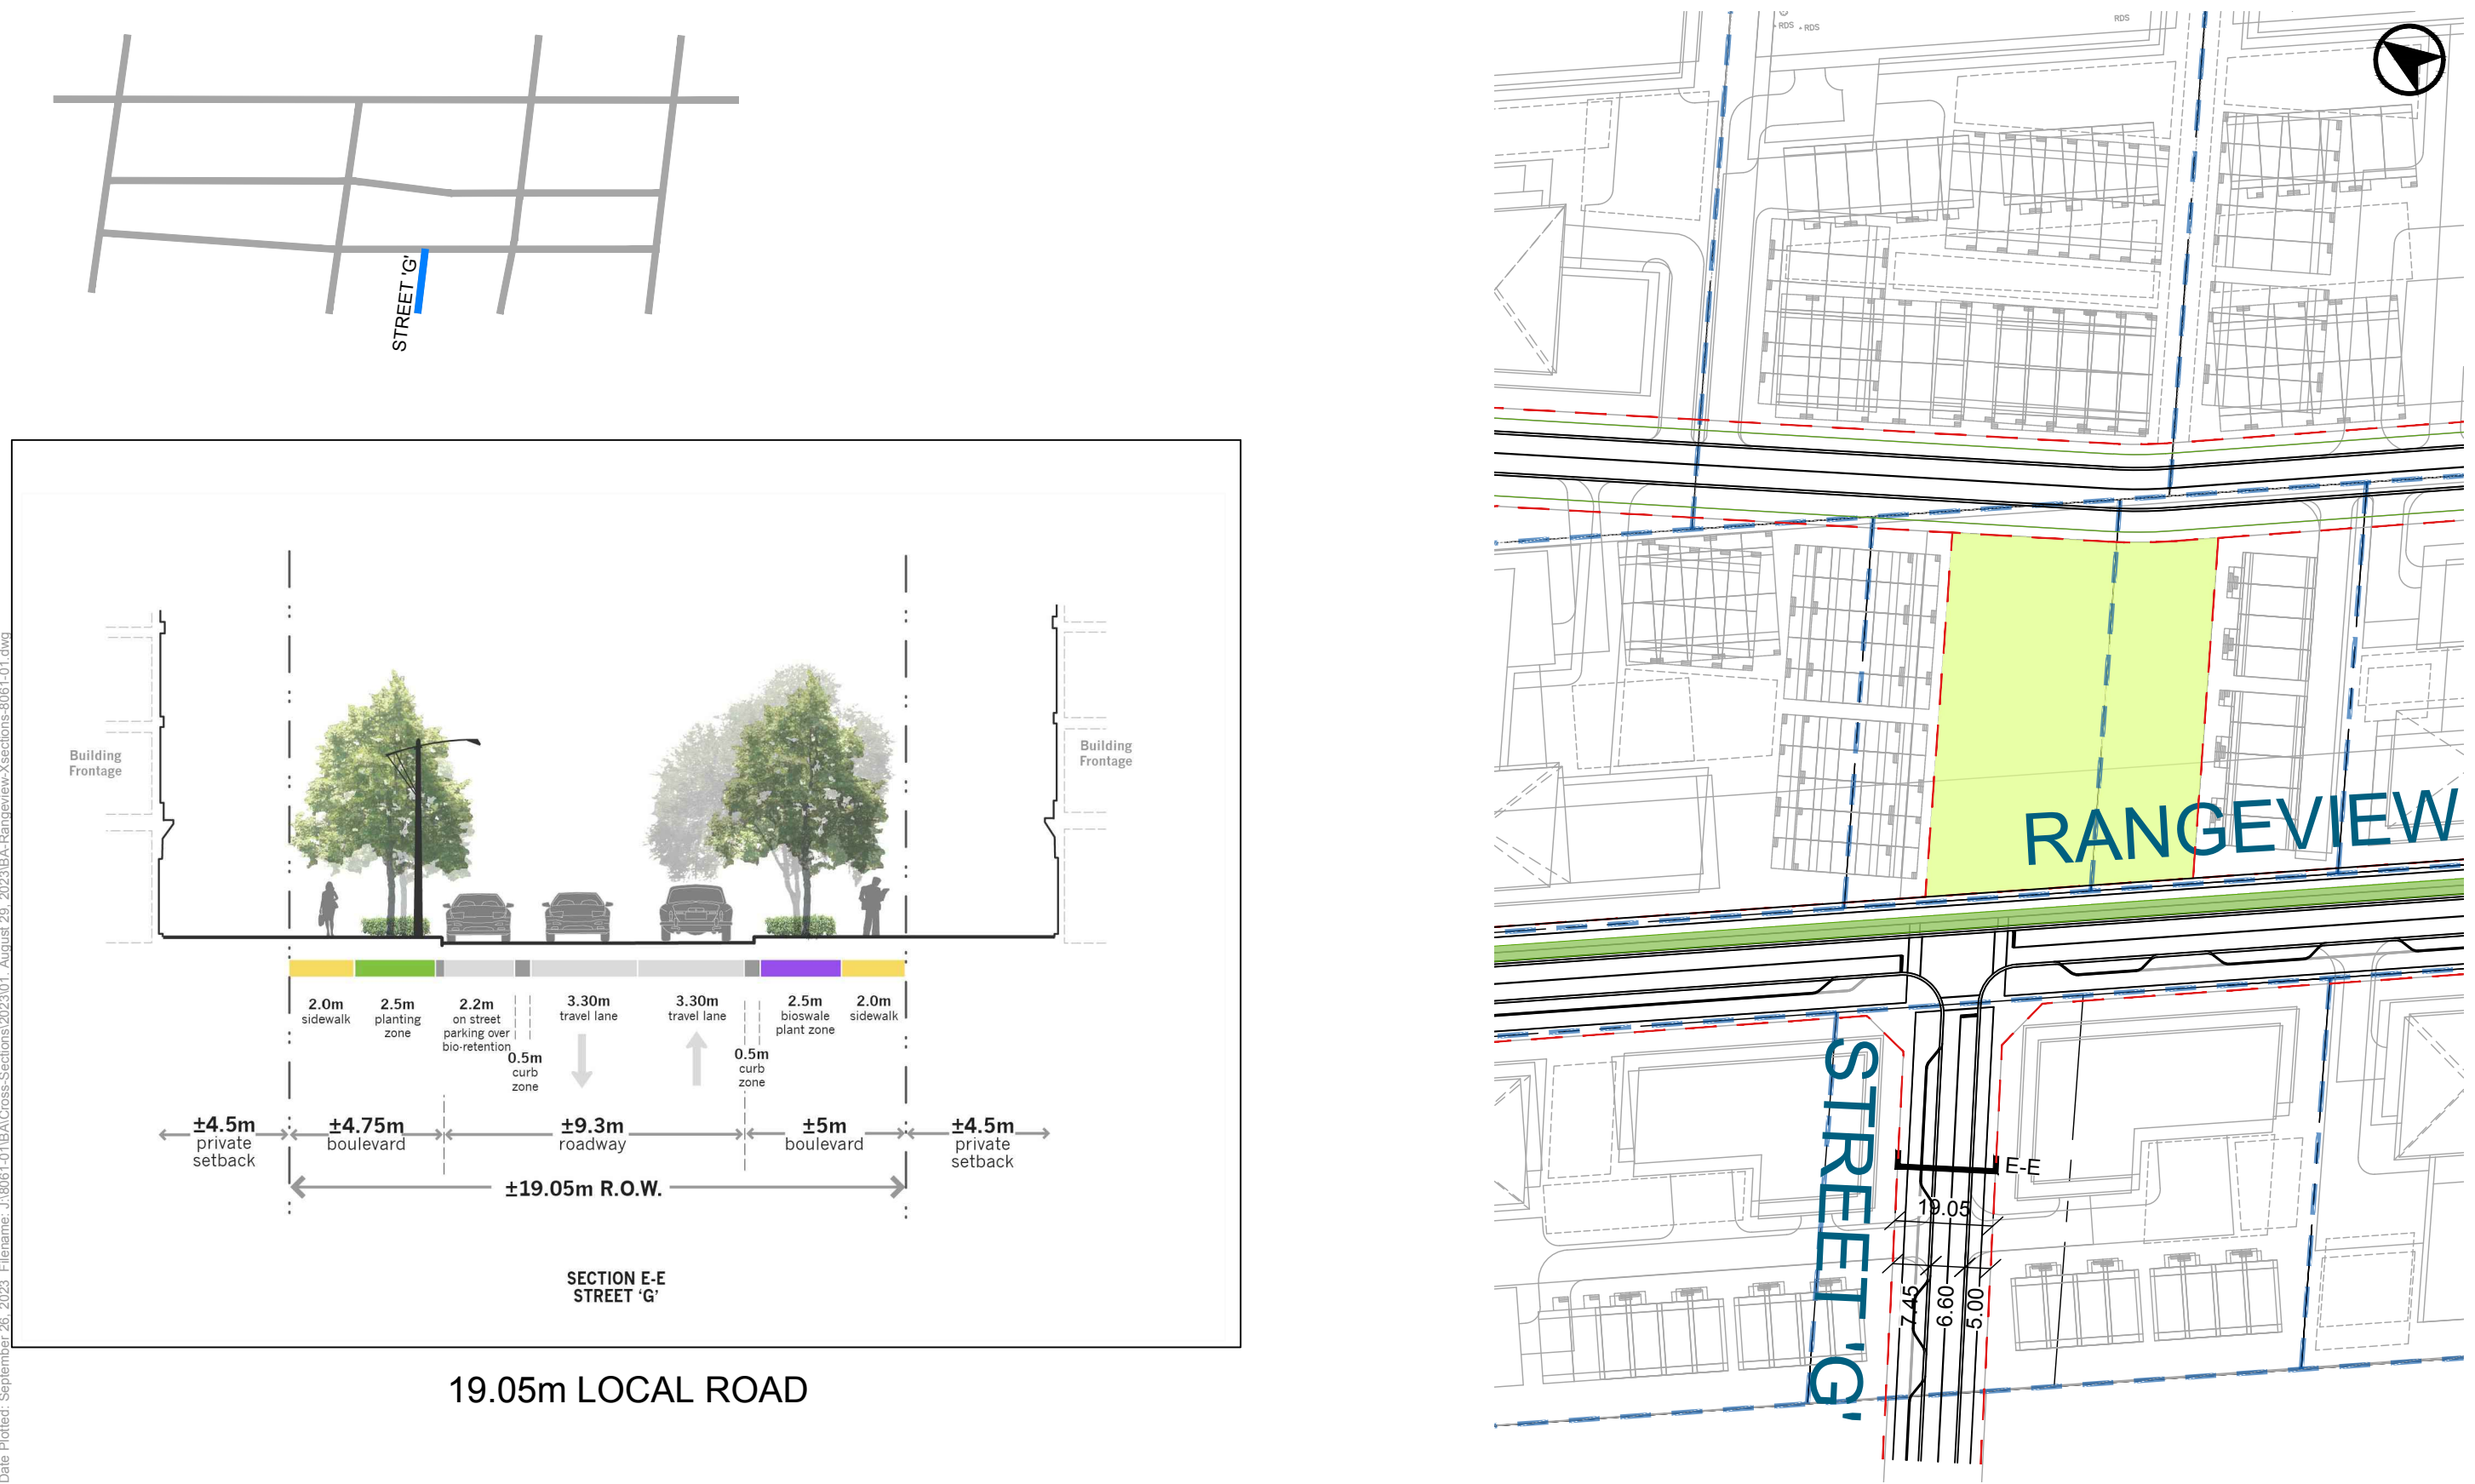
RANGEVIEW ROAD - FUNCTIONAL PLAN & CROSS-SECTIONS
